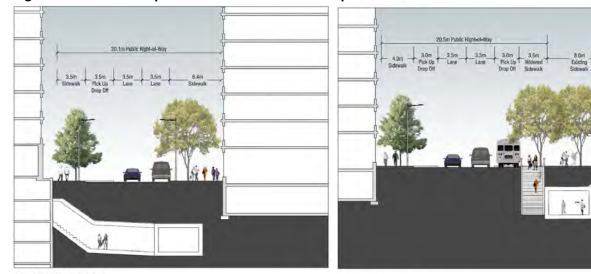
Streetscape Plan and Functional Transportation Plan - York Street Cross Sections
